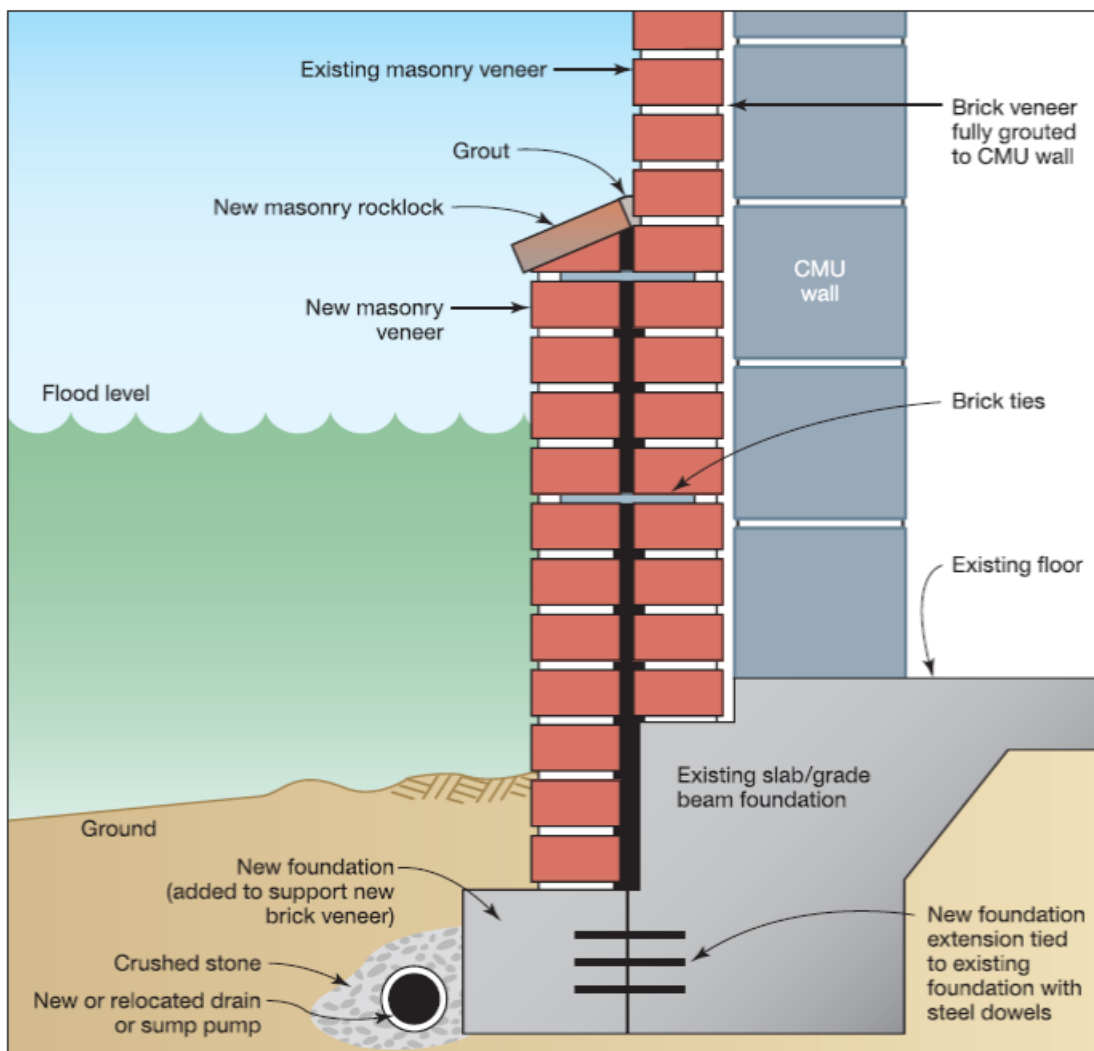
D-2. A way to seal an existing brick-faced wall is to add an additional layer of brick with a seal in between. Please note that weep holes and wick drains work both ways to allow for moisture passage from high to low pressure. Weepholes and flashing should be located above the DFE, and the veneer below the DFE should be fully grouted.
